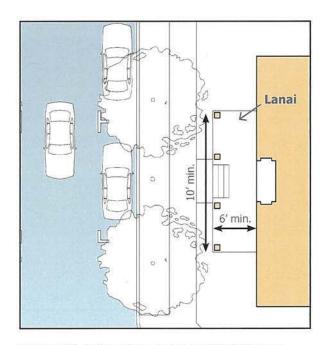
Plan View, Lanai and Yard Frontage (Illustrative)
